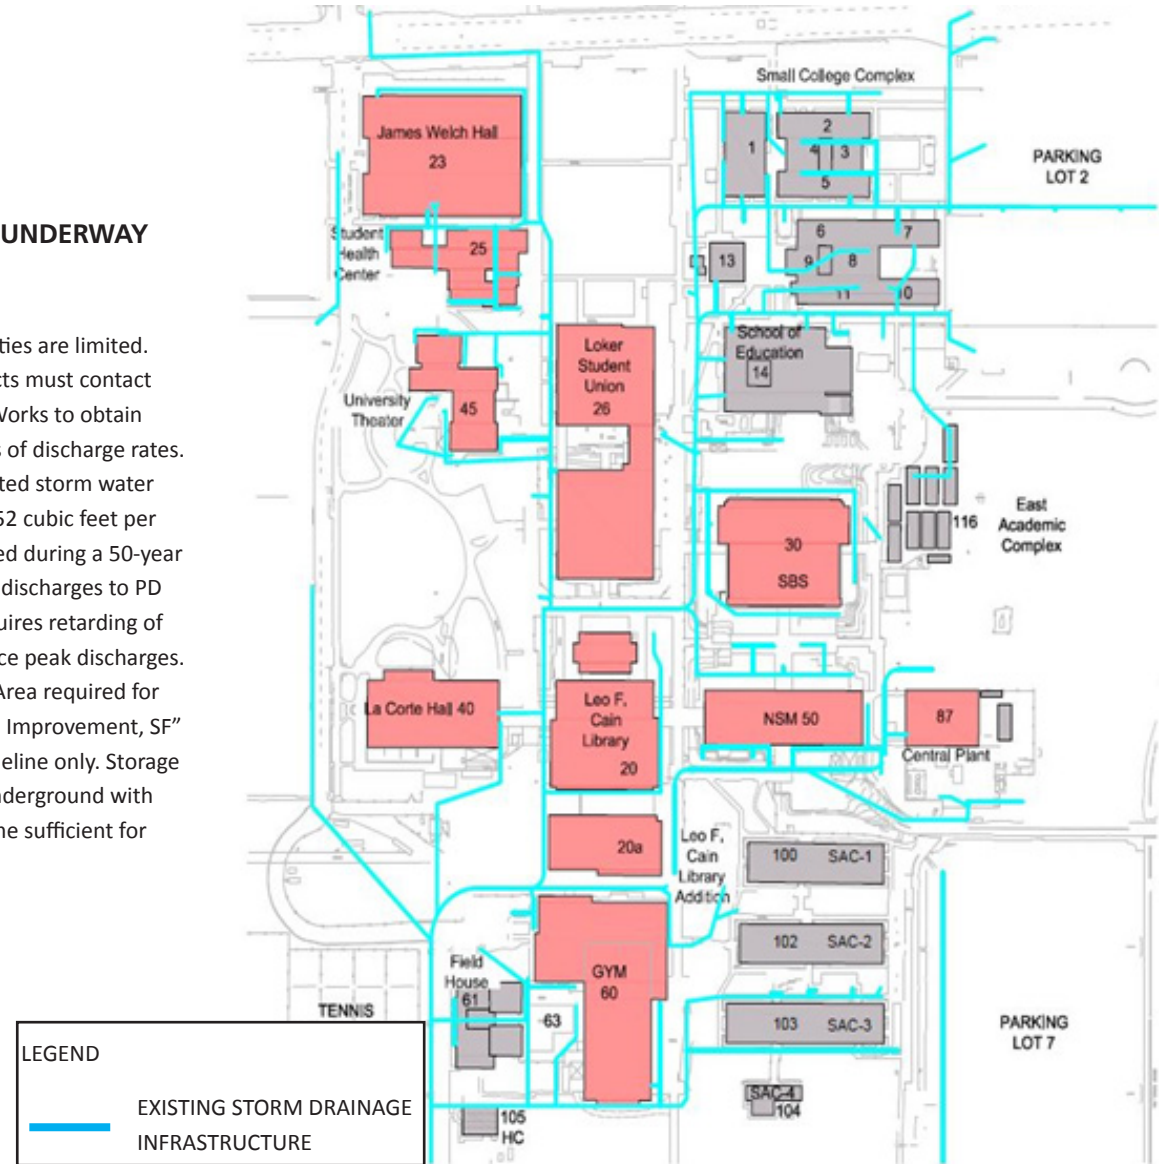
EXISTING STORM DRAINAGE INFRASTRUCTURE
